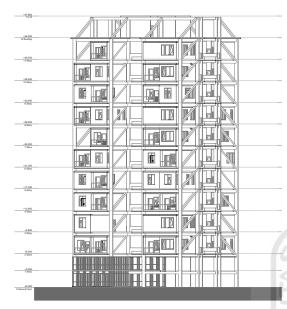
Apartment west elevation Source: Author (2021)
